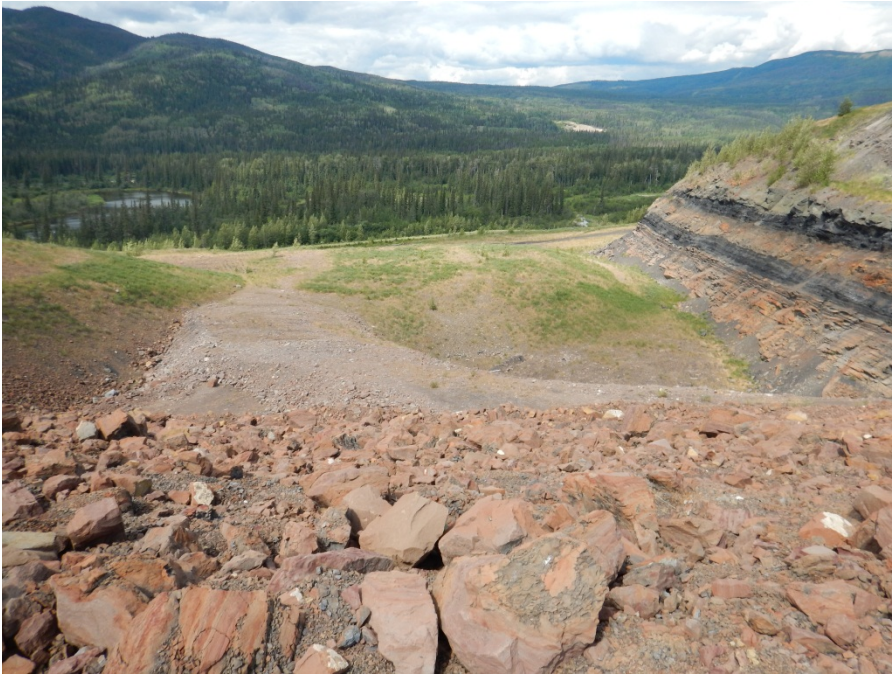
Overview of NSTD dam crest. No signs of movement or settling (e.g. sinkholes, cracks, slumping) observed. (NSTD-2014-02)
